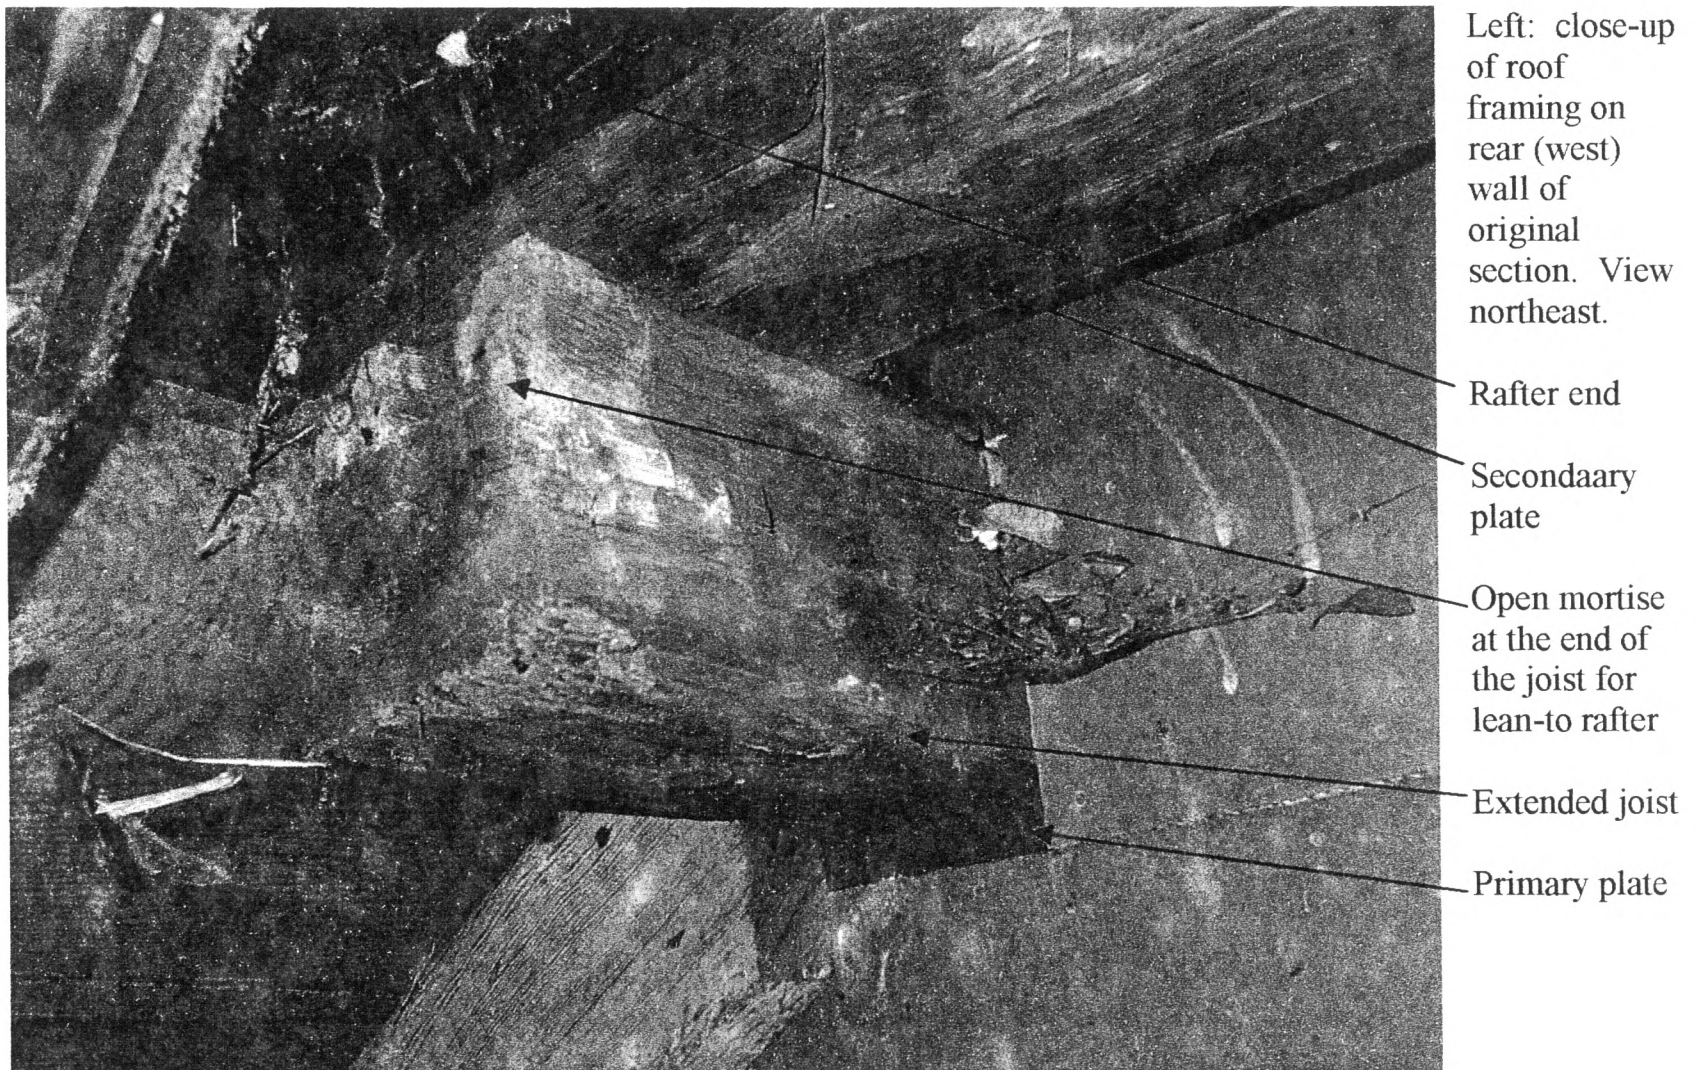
Teal-Foster House--roof framing as seen inside the winder stair to the attic
